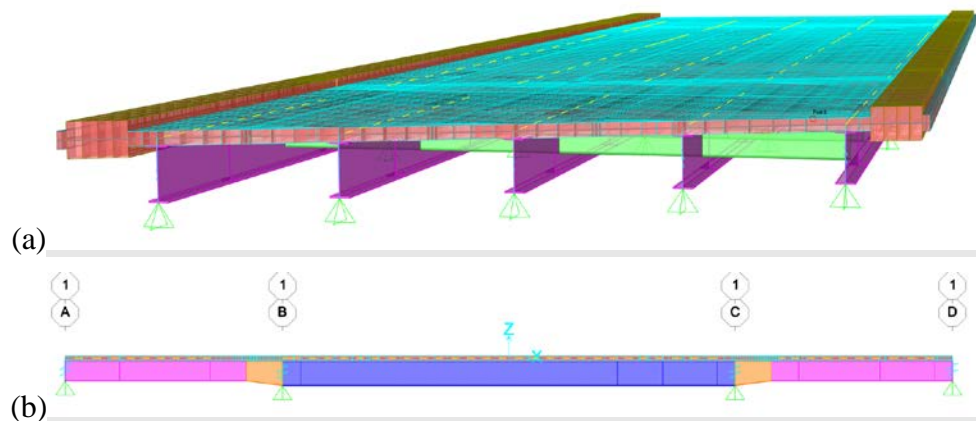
Fairbury Bridge 3D FE model: (a) 3D view and (b) elevation view.
